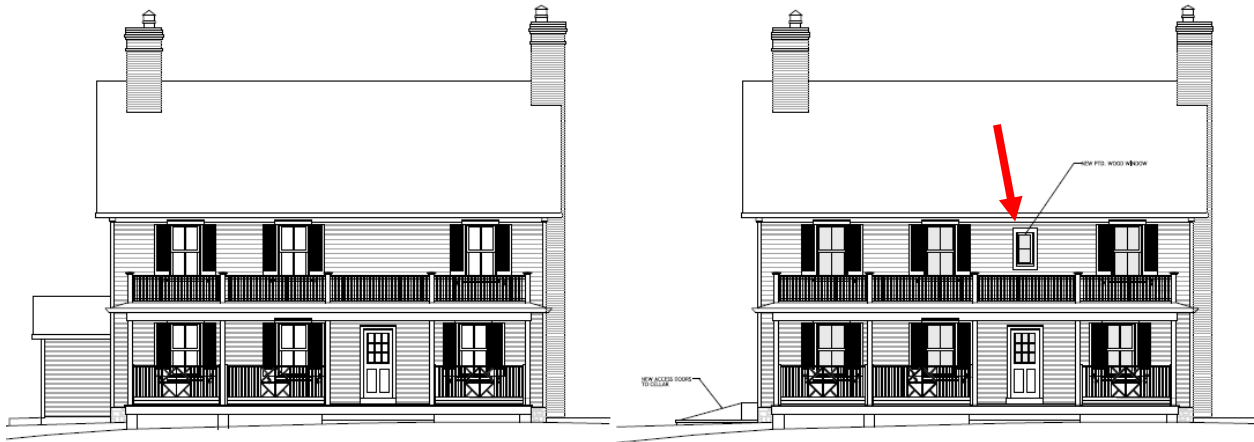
East elevation drawings, existing (left) and proposed (right). The red arrow points to the location of the proposed window.
